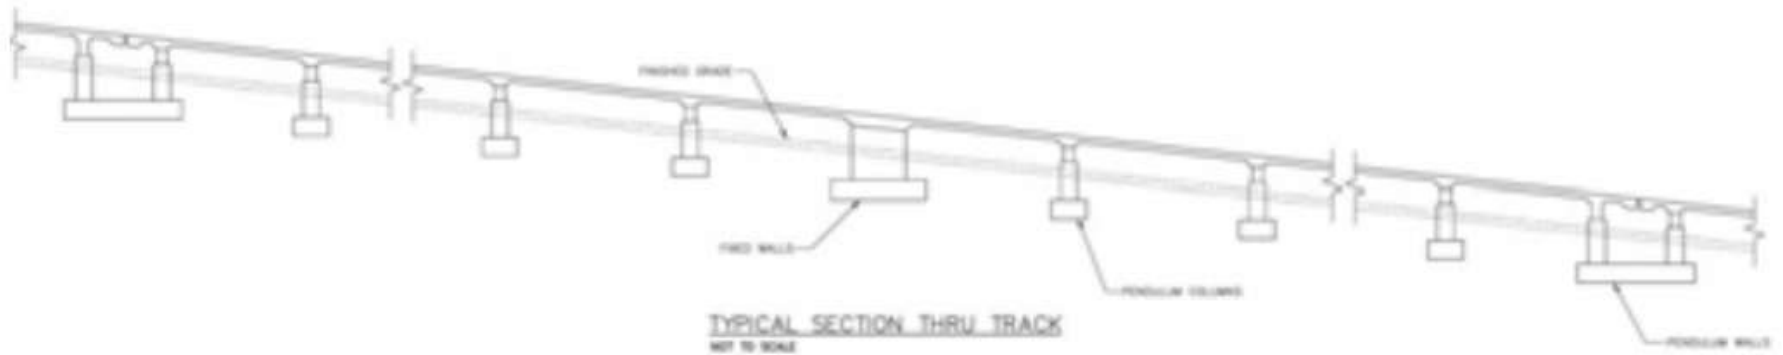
Typical section through the track (from Stantec Architecture Ltd. Drawing A0-17.031-26).
